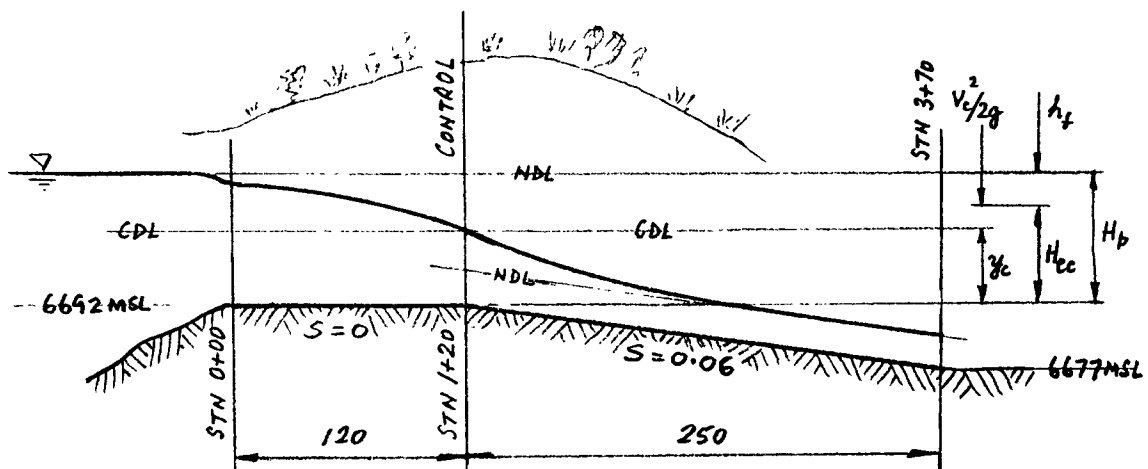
CROSS SECTION OF MAIN DIVERSION SPILLWAY
